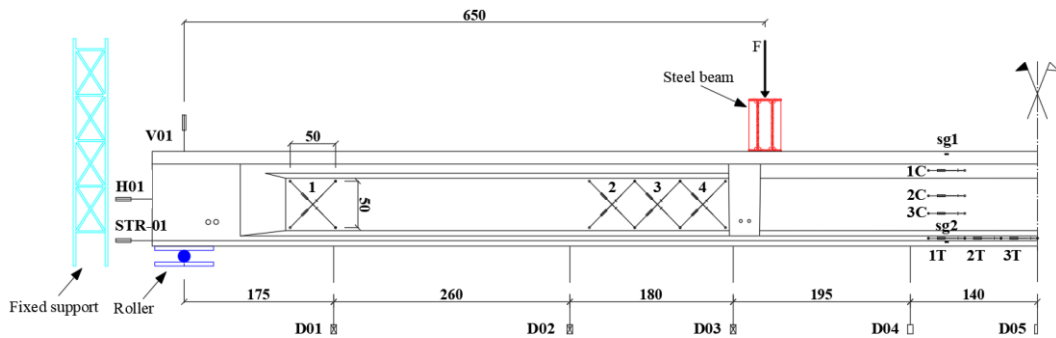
Test setup and layout of the monitoring system installed on B6-Ab/P47 girder (unit: cm).
